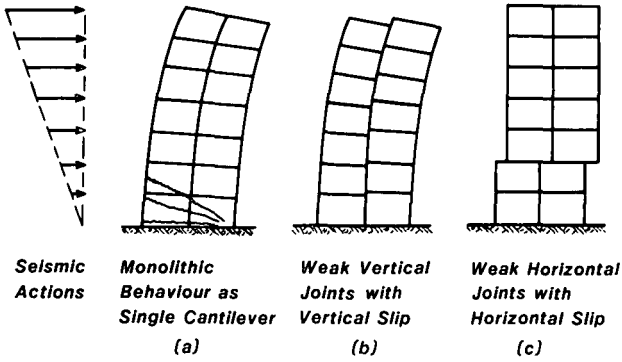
Panelized Wall With Monolithic Behaviour, Slip Along Vertical Joints and Slip Along Horizontal Joints, When Horizontally Loaded
